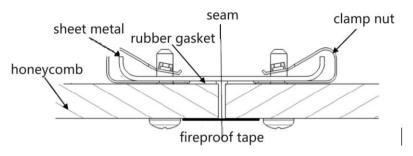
Typical Butt-Jointed Honeycomb Panels
